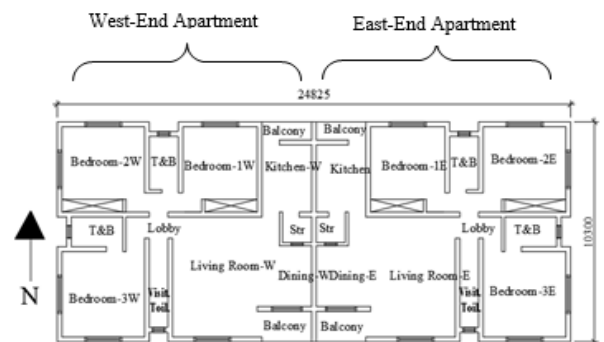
Floor Plan of the twin-apartments (as captured in AutoCAD-2020 version)
